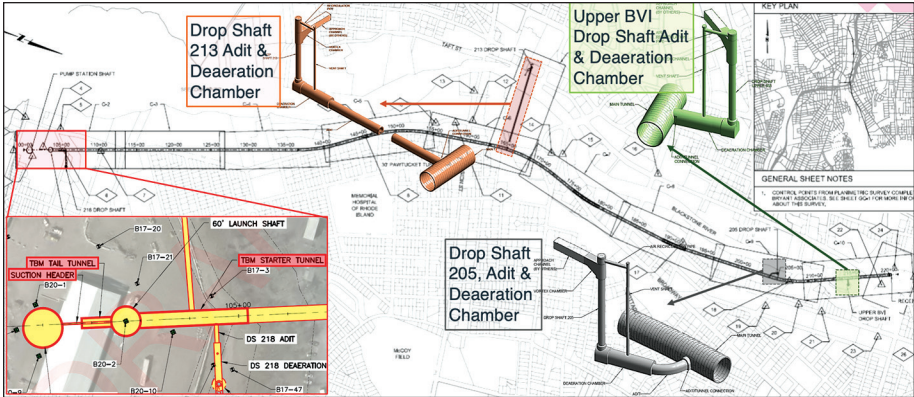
Layout of the Pawtucket Tunnel and connecting structures (receiving shaft is not shown)
